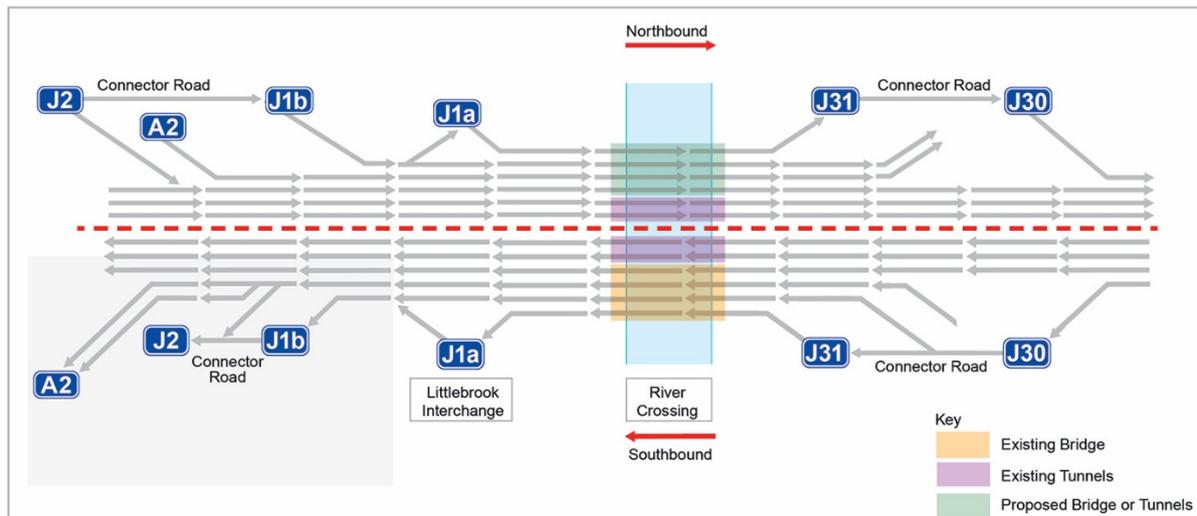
ROUTE 1 SCHEMATIC LANE LAYOUT
